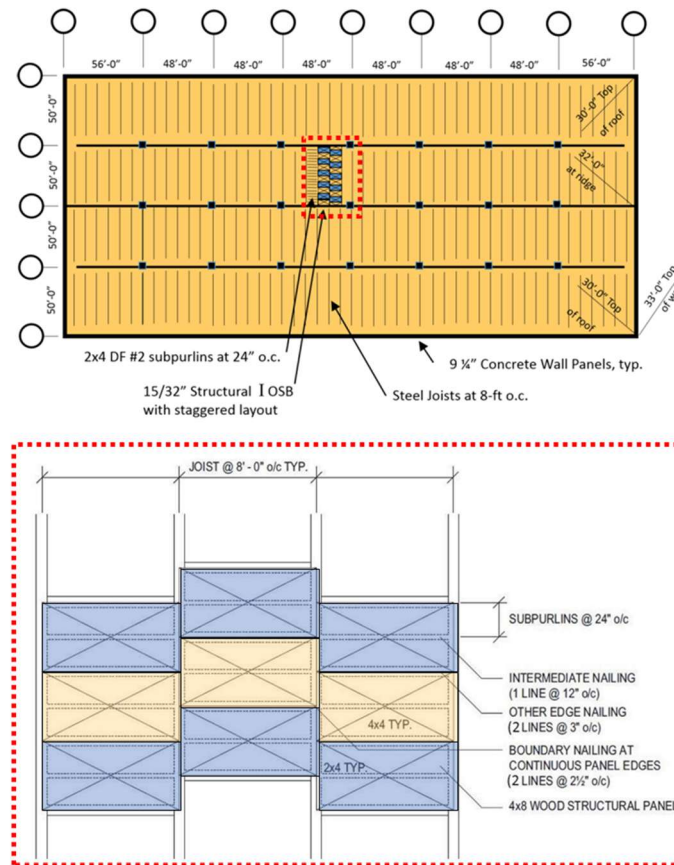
Main components of a modern wood diaphragm system: primary framing (above), local sheathing and framing details (below). Images adapted from Wade et al. (2018) and Lawson (2013).
